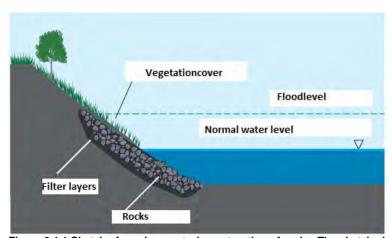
Sketch of erosion control construction of rocks. The sketch show a modern construction where vegetation measures are included in the plan. (Sketch modified from Vassdragshåndboka, Rune Stubrud, NVE)
